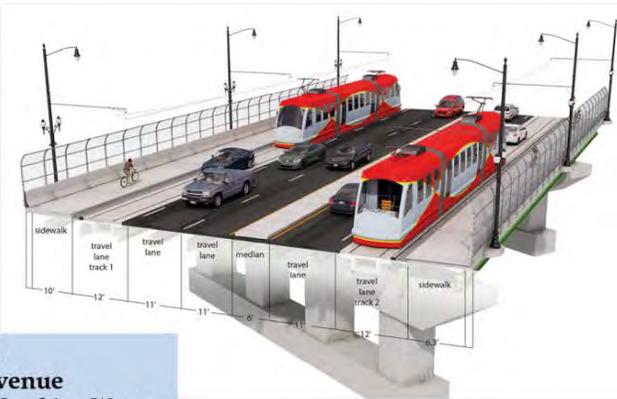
Build Alternative 1 Typical Sections (Wired Propulsion System)
